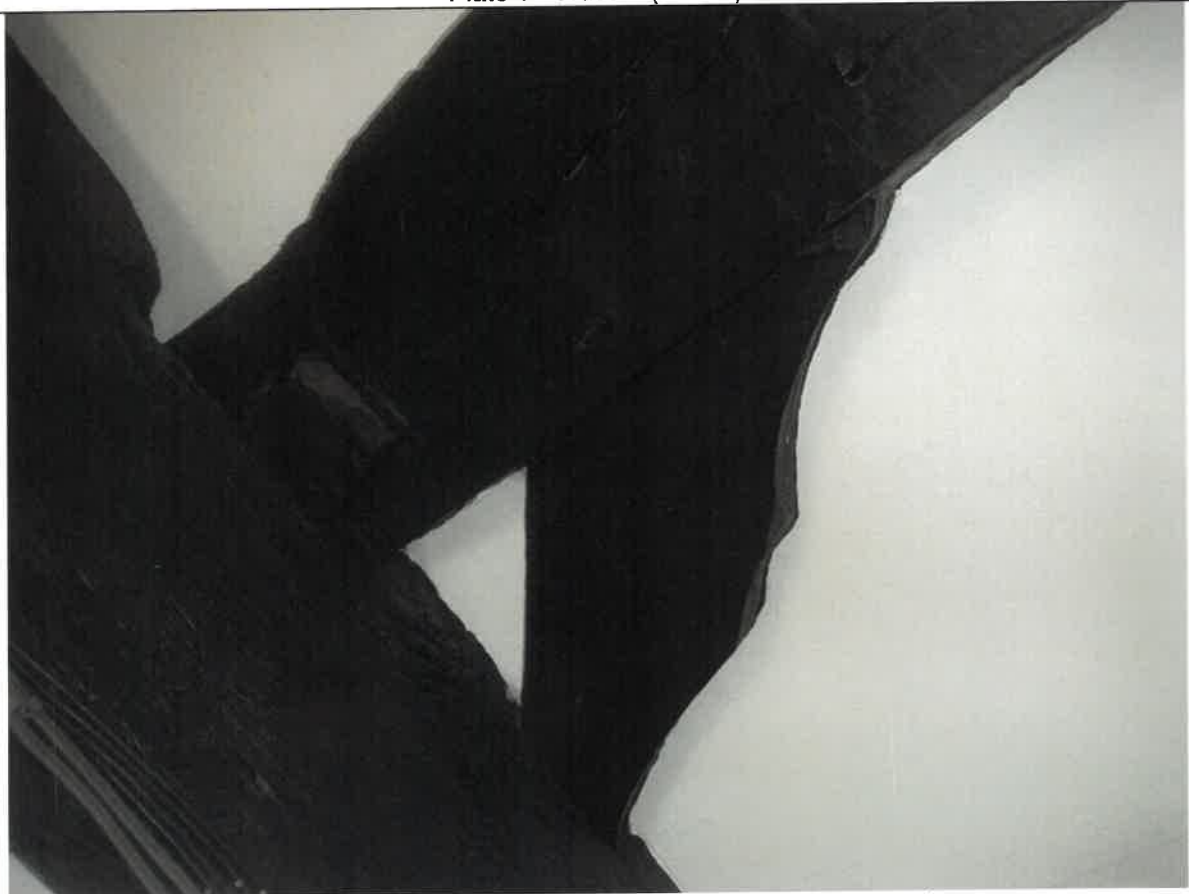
Surviving wind-brace on Truss 1 (E face, N end)
